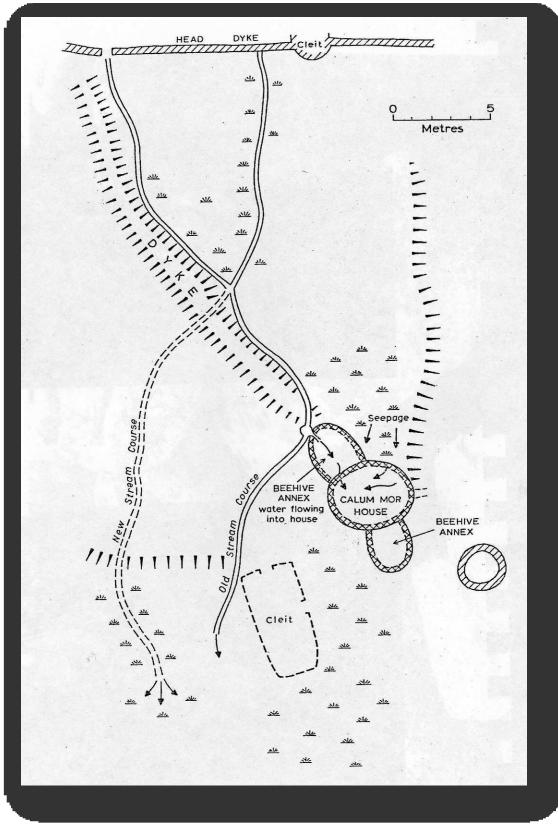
Plan of drainage works undertaken (Cottam 1973, Fig 1).
